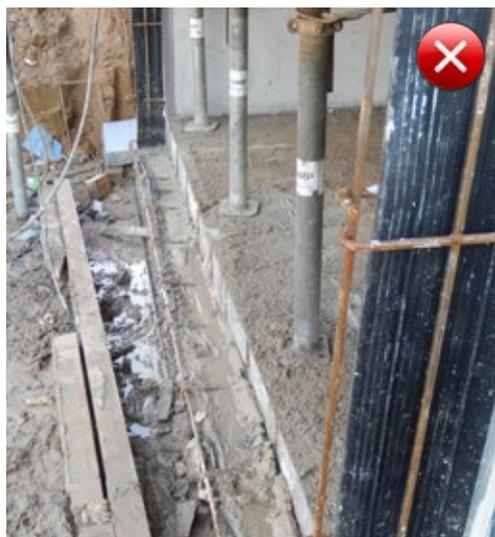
Dirty and contaminated waterbars after concreting the first section of a base slab, now requiring thorough cleaning and inspection before concreting
